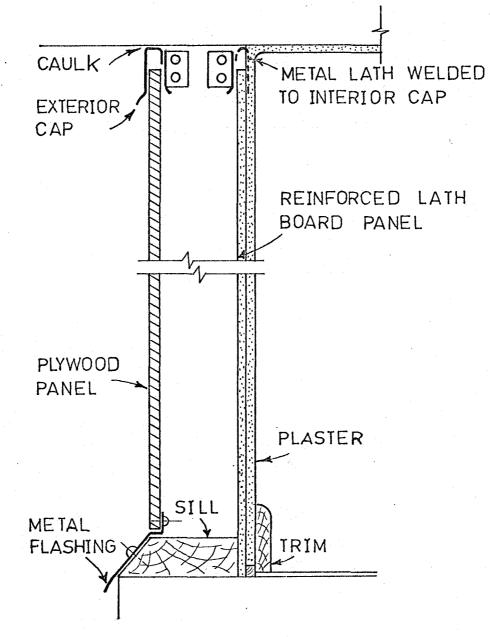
VERTICAL SEC. THRU' EXTERIOR WALL SHOWING PLYWOOD EXT. PANEL & PLASTER INTERIOR
